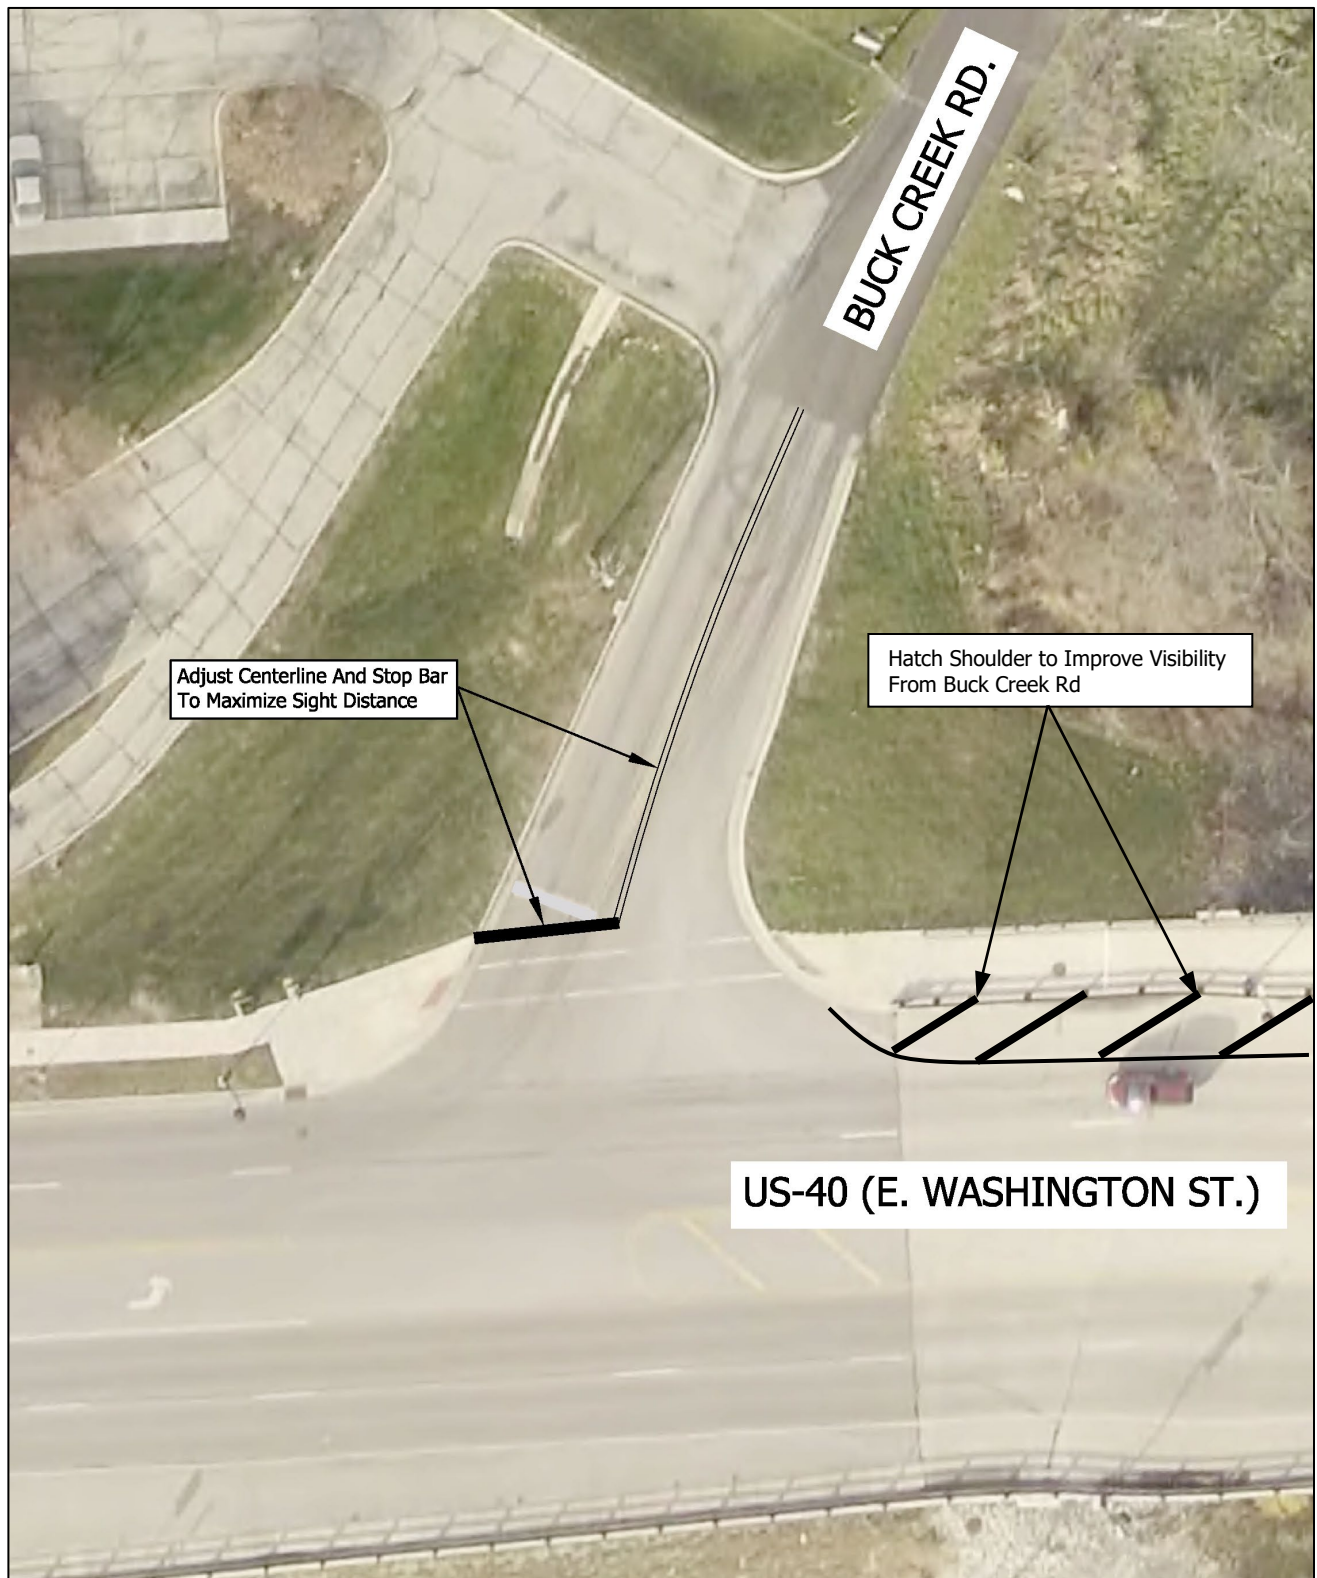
US 40 & Buck Creek Road Striping Improvement Concept
